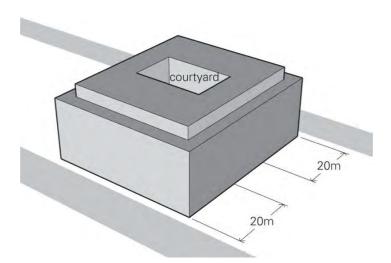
Courtyard type buildings allow good light penetration and well suited to sites with two street frontages
